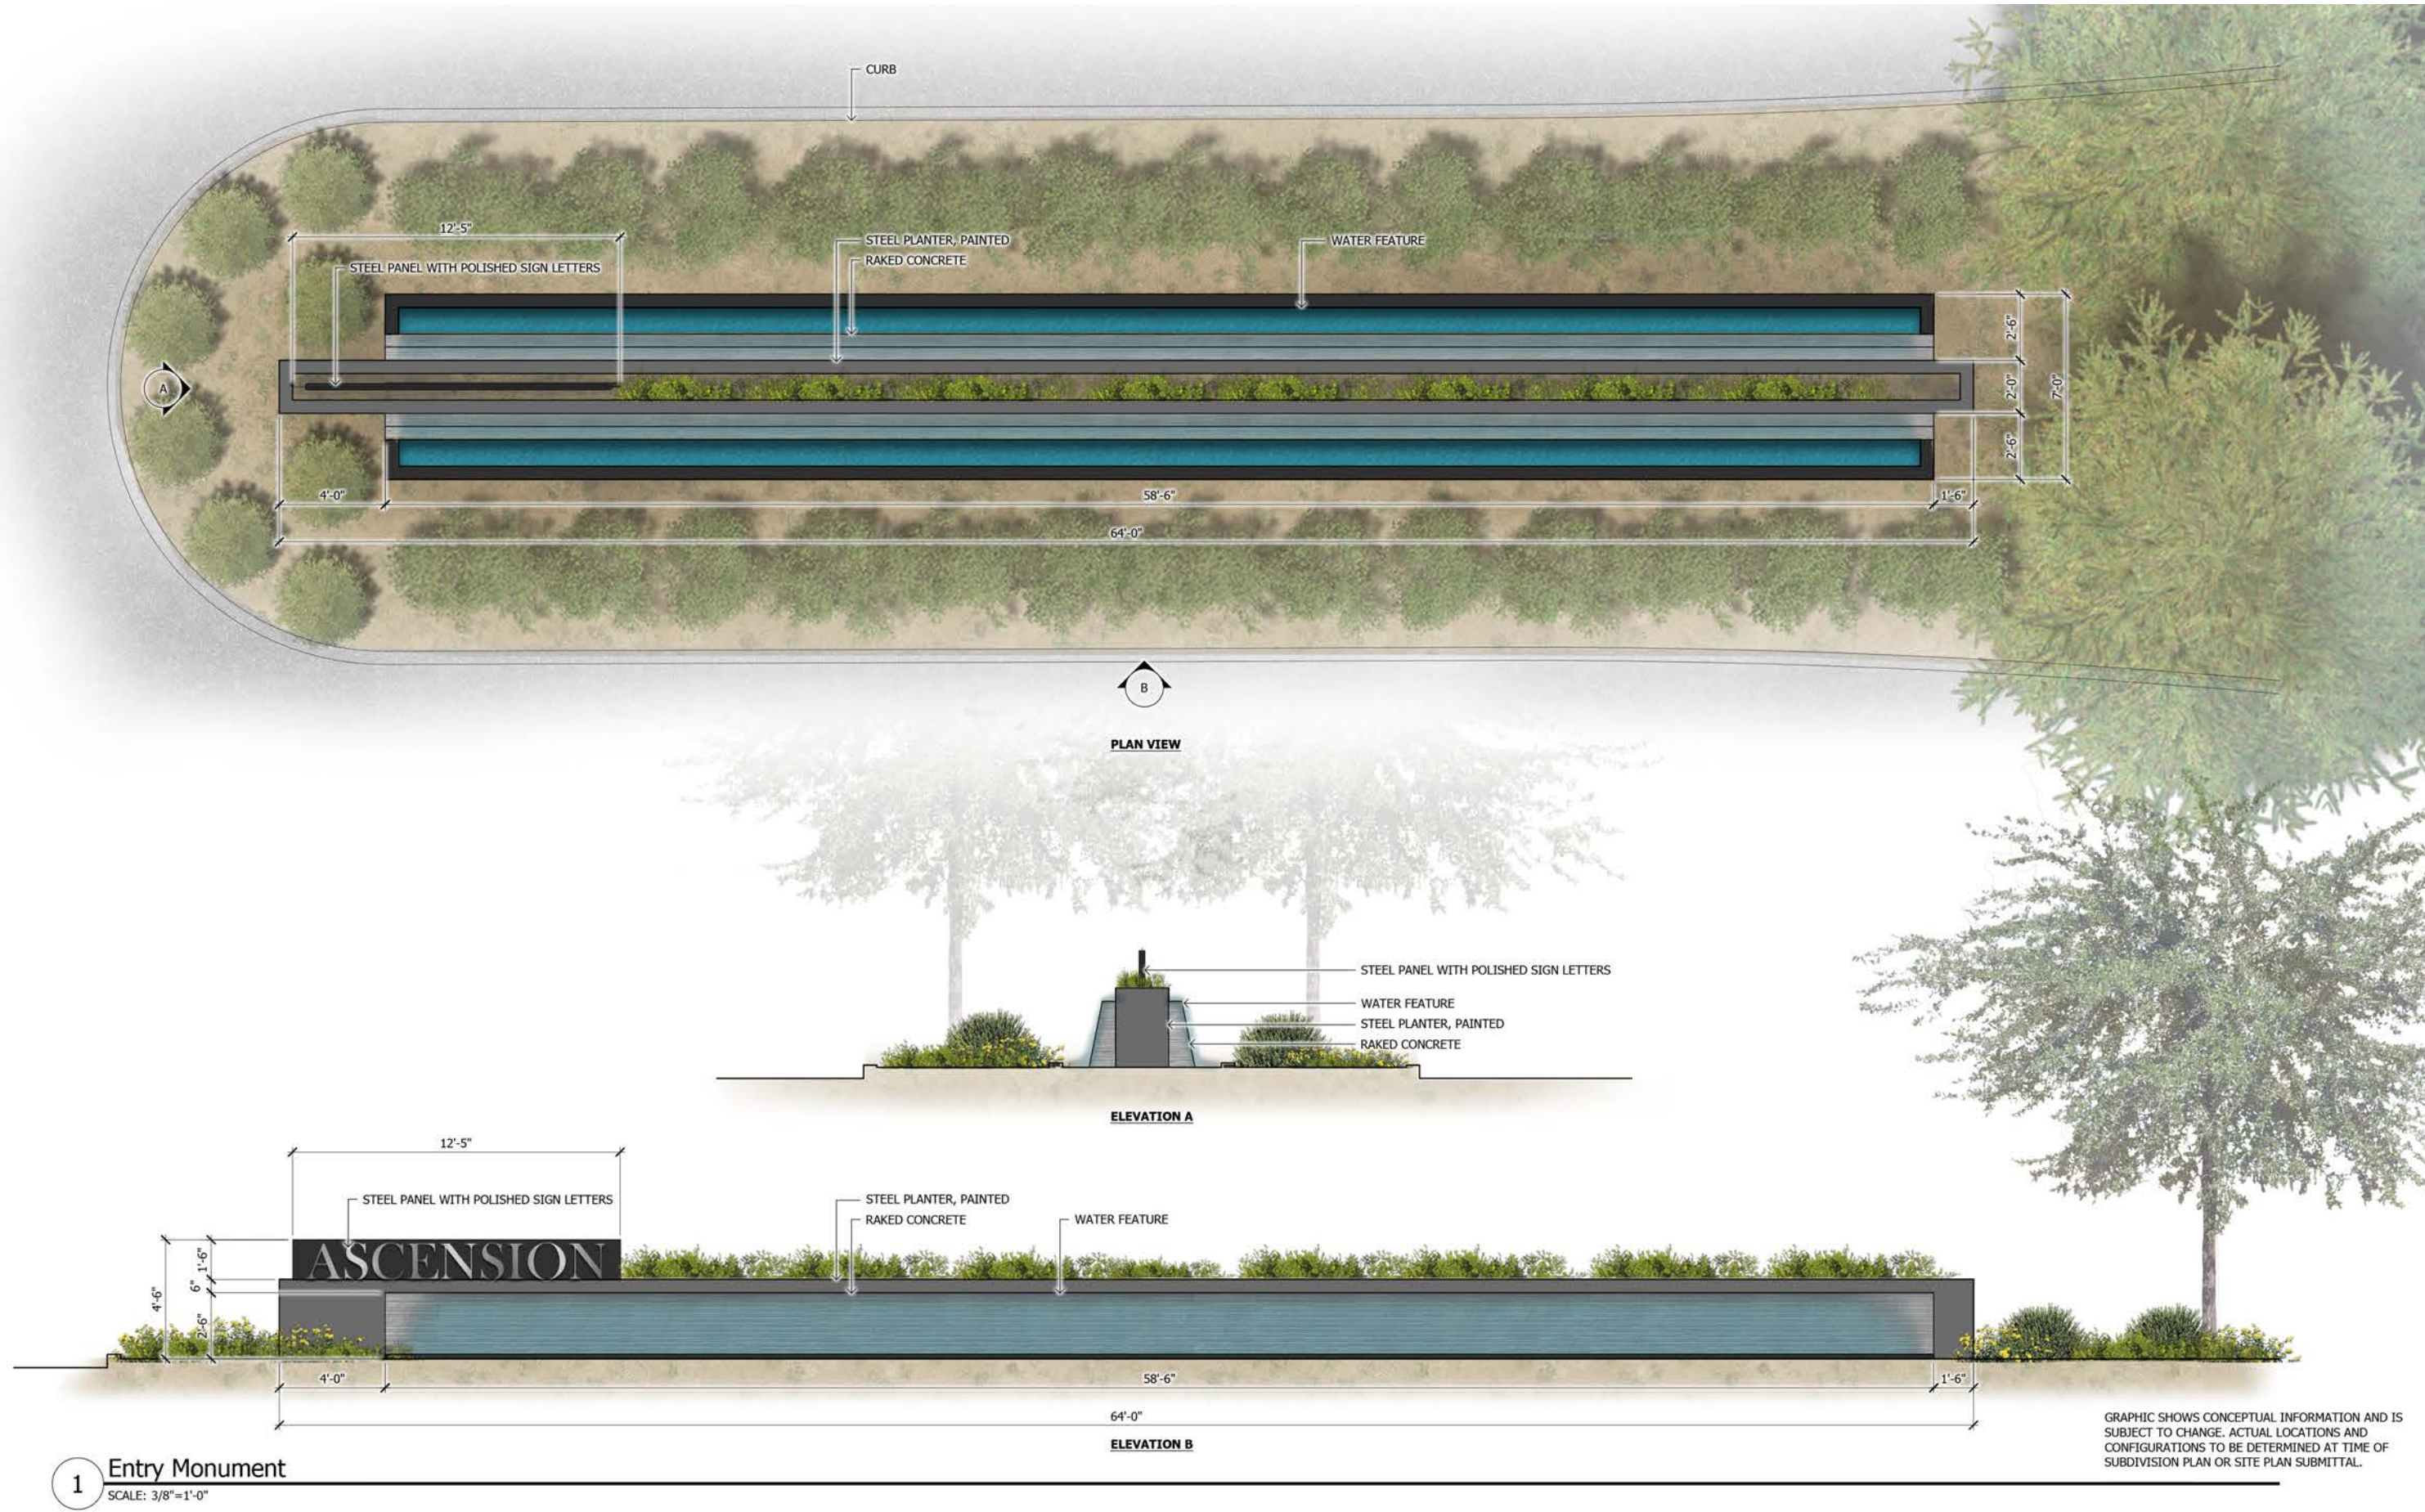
B: WALL, FENCE, AND GATE DETAILS CONTINUED
